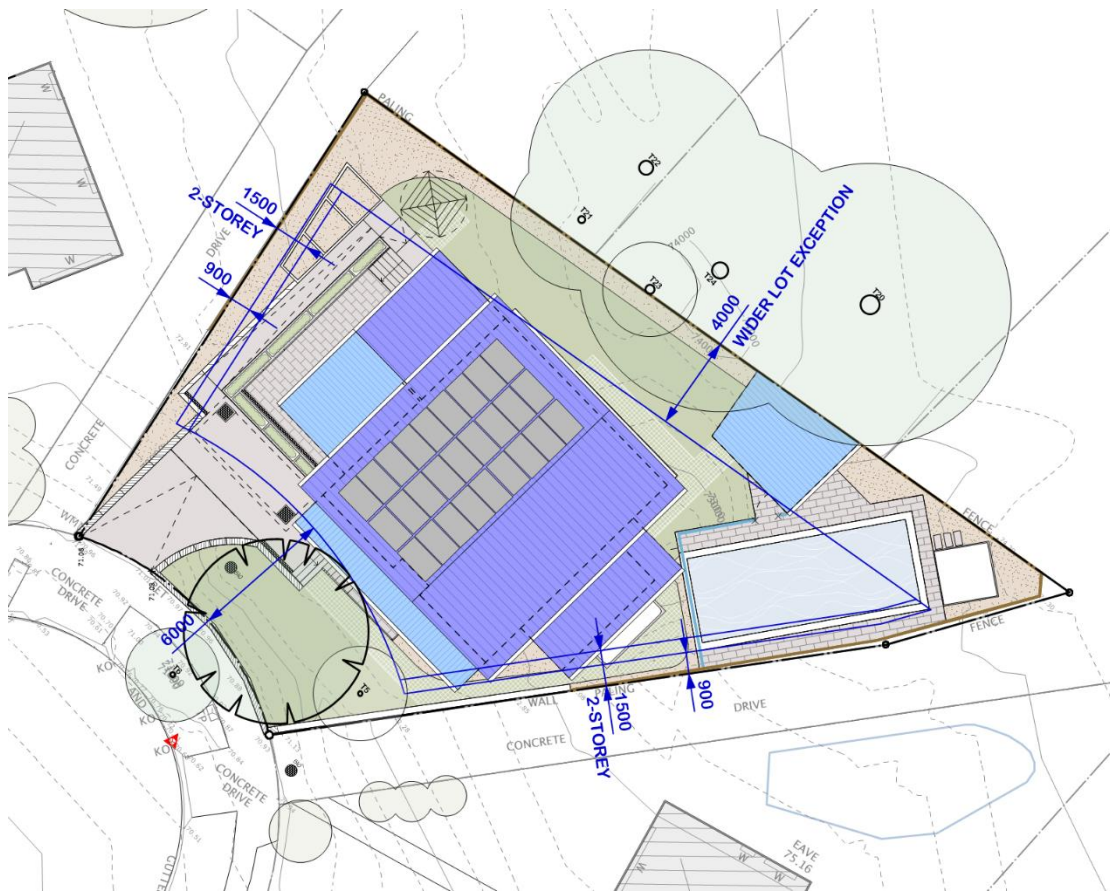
Proposed site plan of subject site with DCP setbacks. Source: Envirotexture
